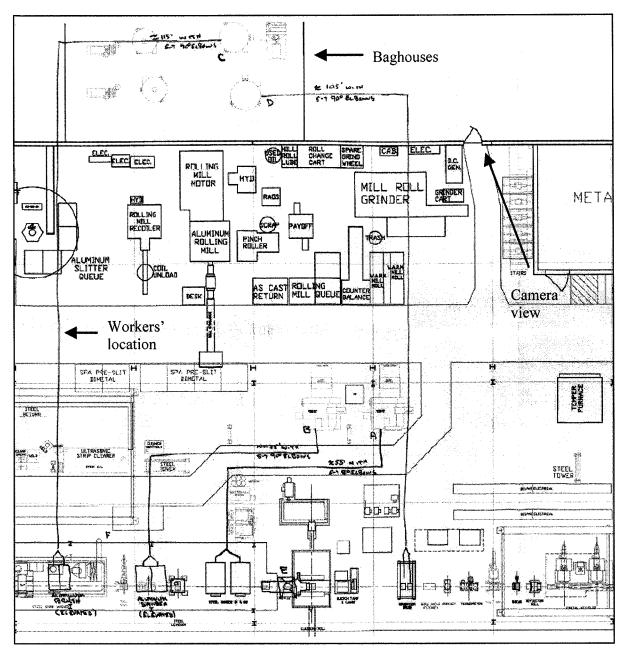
Floor plan of the plant area and baghouses. Annotations in red added by CSE.
